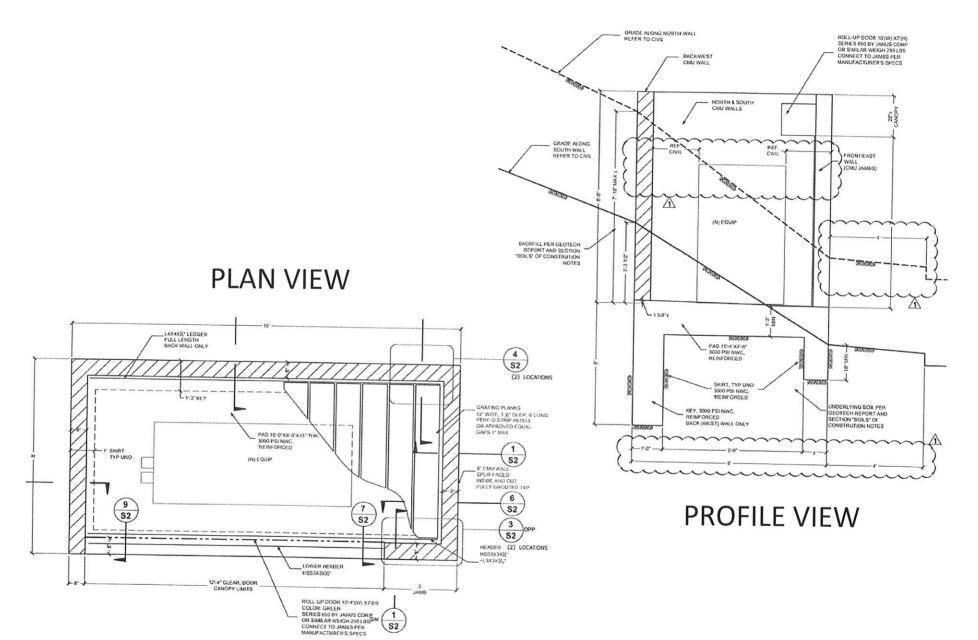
EXHIBIT A PERMITTED IMPROVEMENTS PLAN
